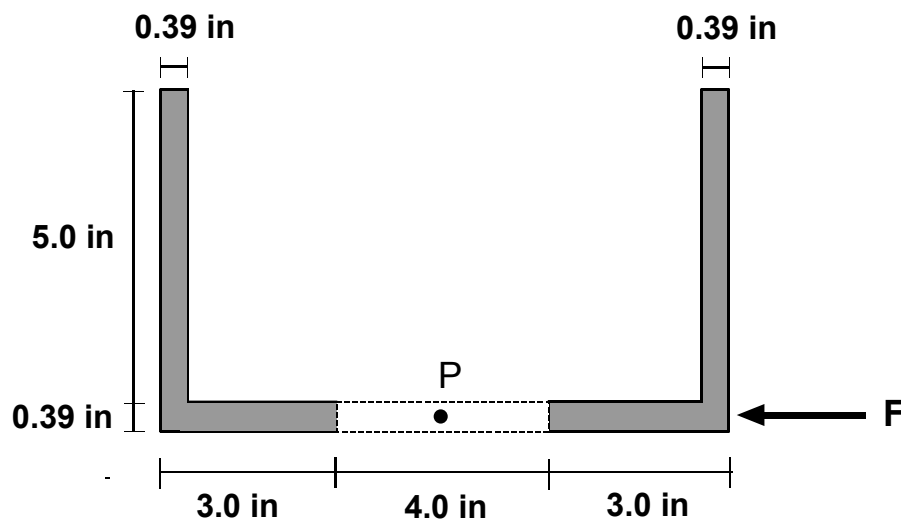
Plan of the Open Section Shear Wall Assembly
